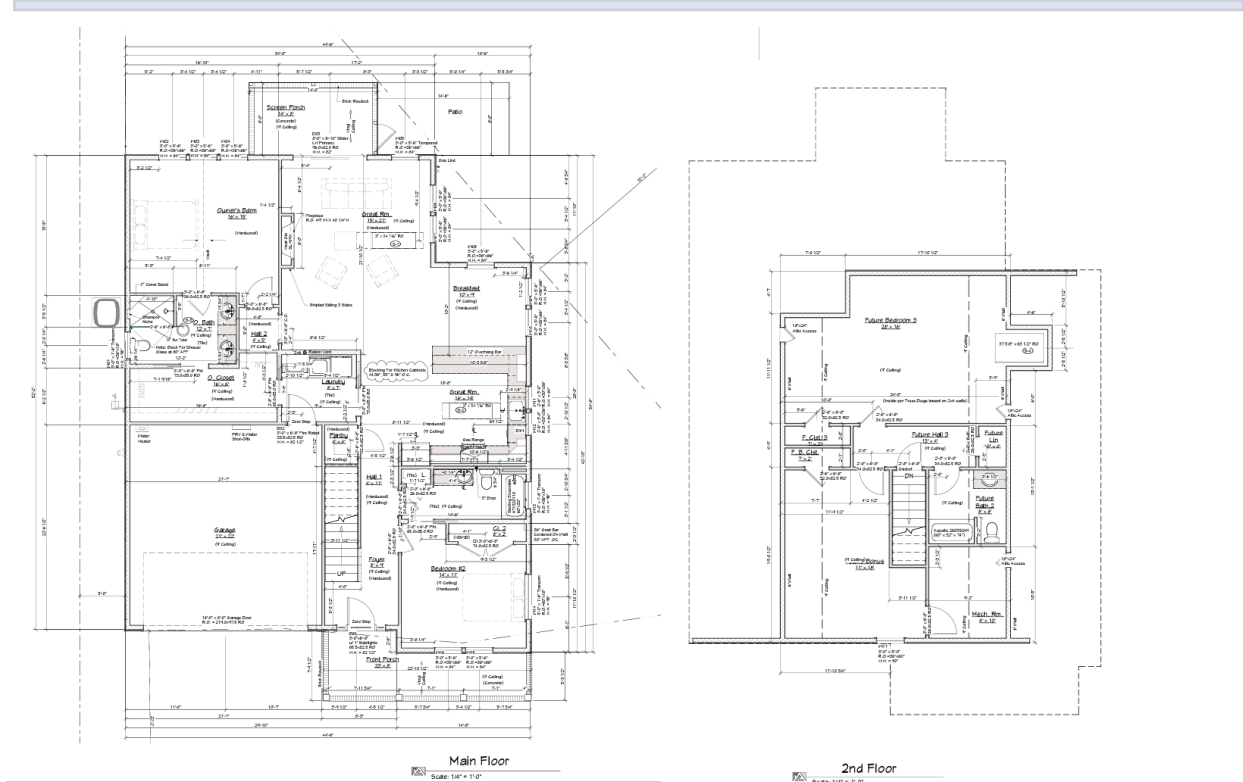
Usher Residence custom home STCBT pilot test – floor plans
